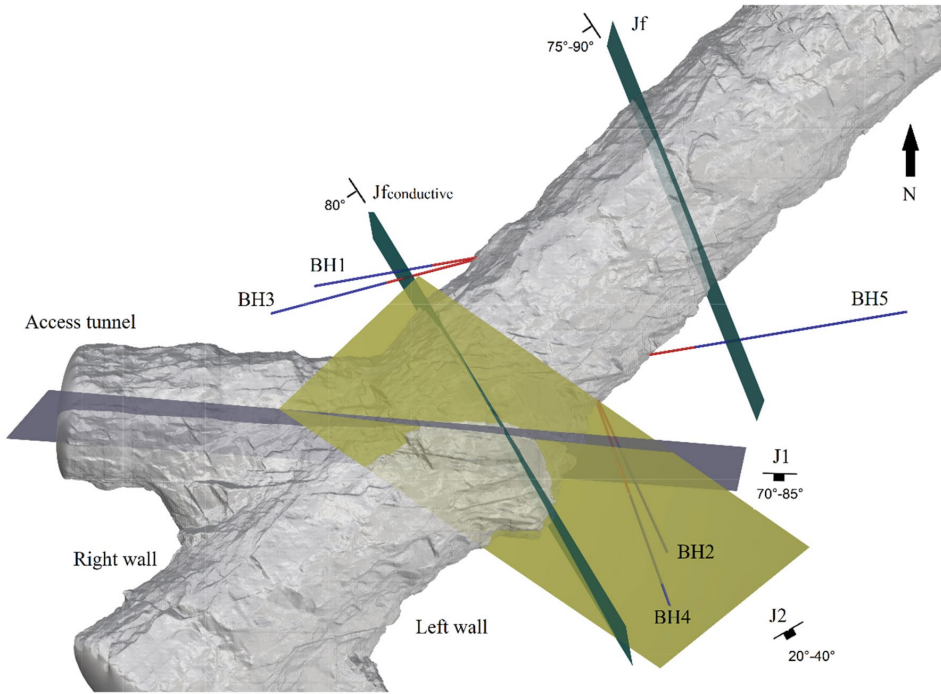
Plan view of jointing conditions and orientation of boreholes at instrumentation location
